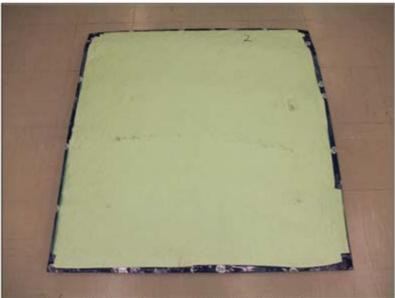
Element Specimen 20-06-B0040-AP2 - Pre Exposure
